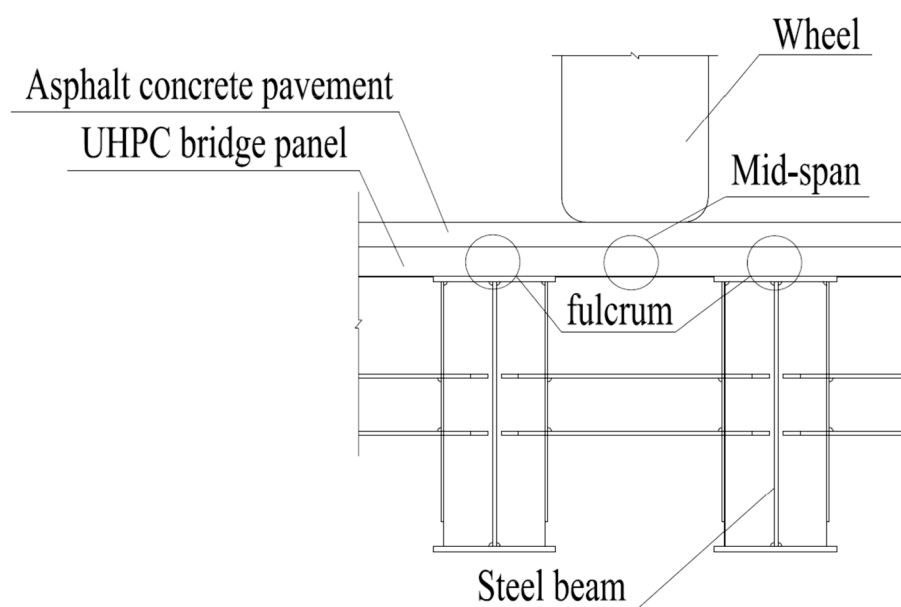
The position of mid-span and fulcrum of the bridge panel
